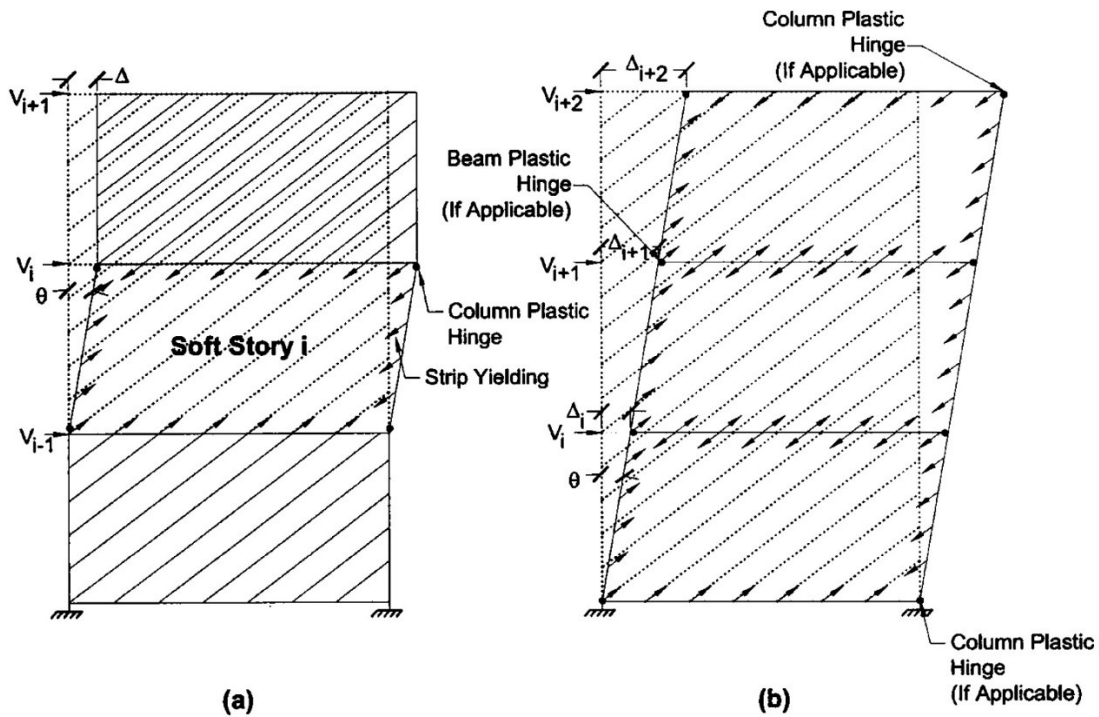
Examples of plastic collapse mechanisms for multi-storey steel plate shear walls (Berman and Bruneau 2003)
